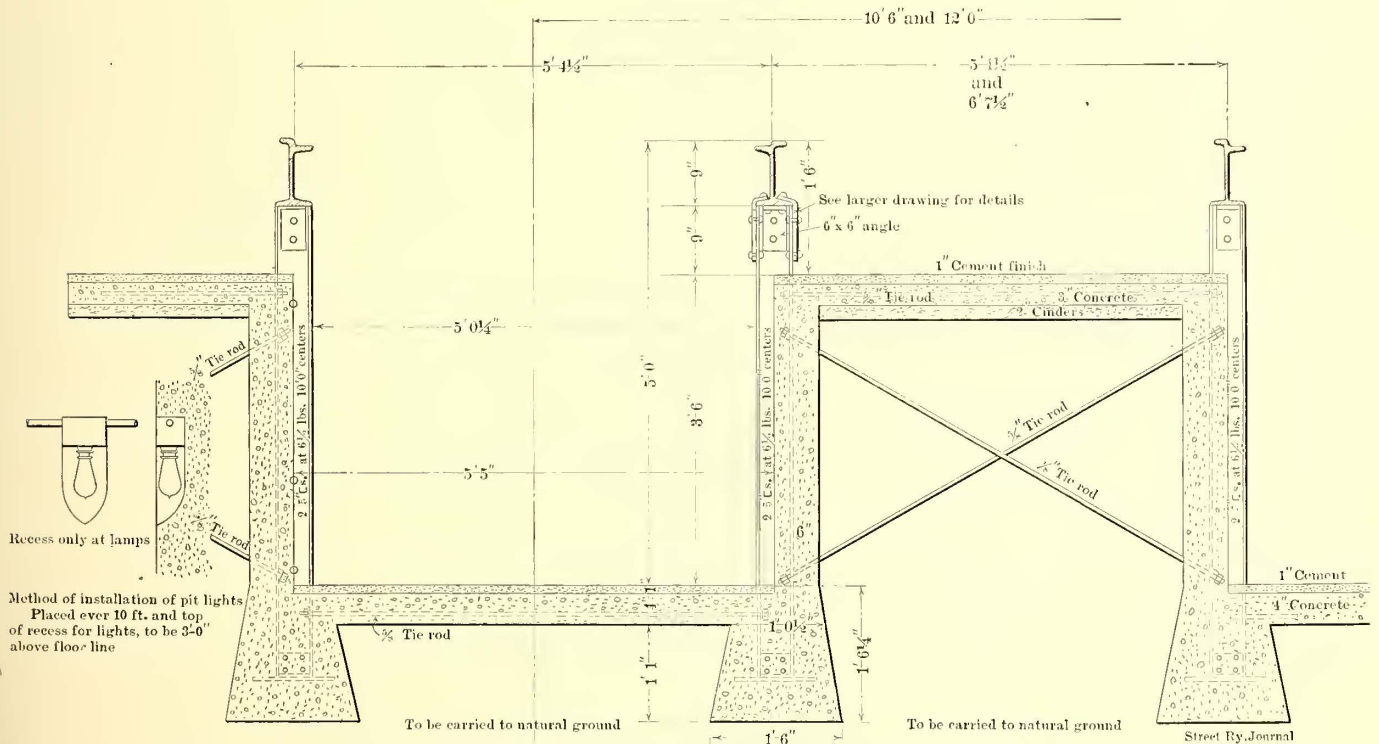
SECTION THROUGH PIT WITH DEPRESSED AISLES
